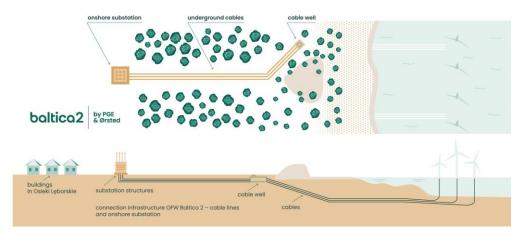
Connection infrastructure OWF Baltica 2 - cable bench and onshore substation
